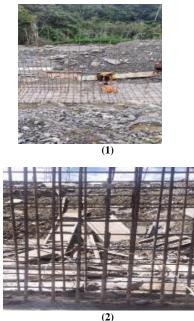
(1) Reinforcement Work (2)Reinforcement Detail Source : Documentation, 2023
